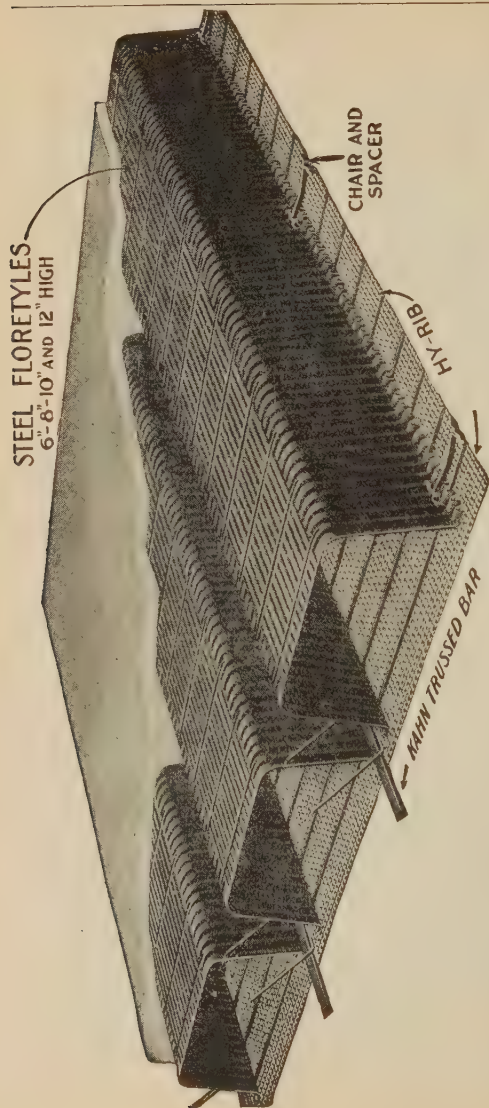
,055.—Truscon steel floretyles. This popular type of reinforced concrete construction consists of rows of specially manufactured hollow steel tile covered with a layer of concrete and separated by reinforced concrete joists. These deep, narrow joists carry the loads directly to the supports, while the floretyles act merely as fillers, saving concrete, reducing dead weight, simplifying centering and economizing construction.
